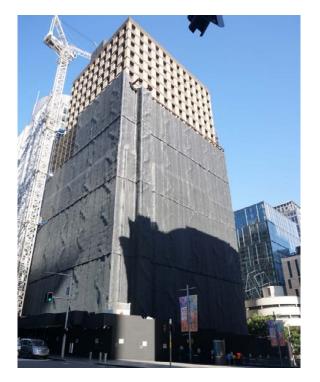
Demolition works occurring on site, as viewed from Elizabeth Street (July 2018)
